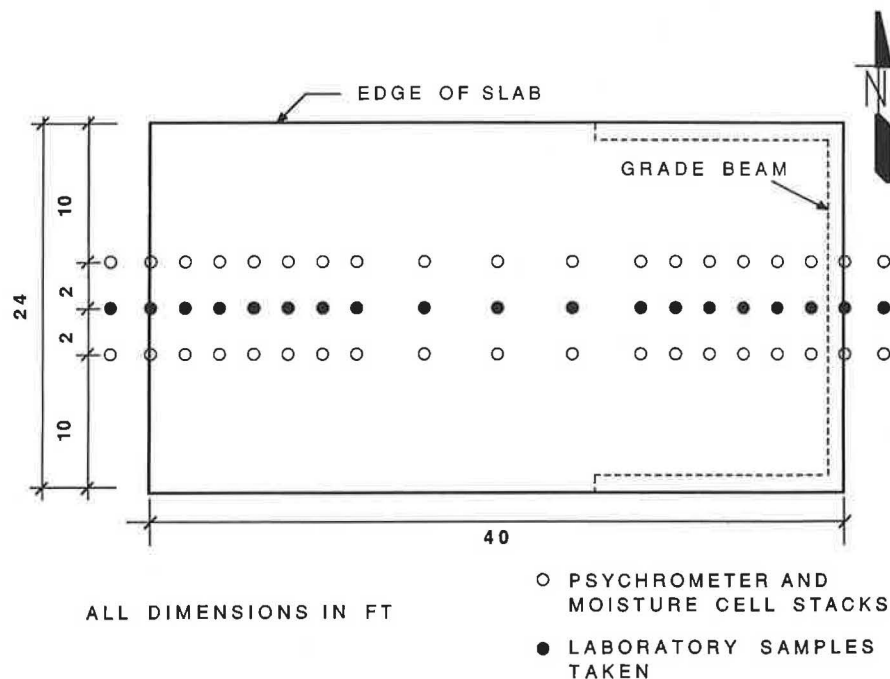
Test site layout showing dimensions of the test slab model, instrumentation stacks, and sampling locations.
